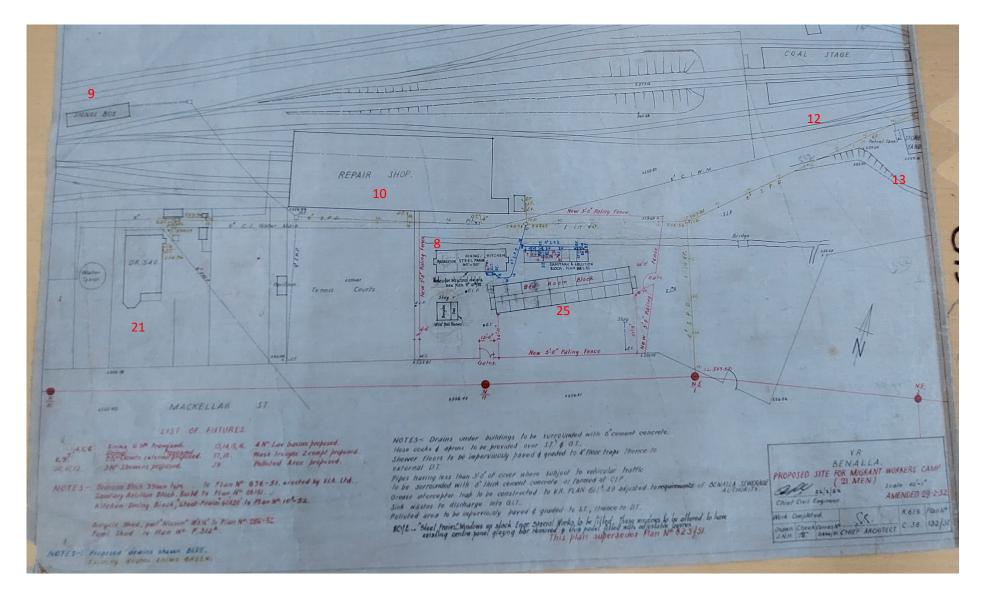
Benalla. Proposed site for migrant workers camp (21 men).
